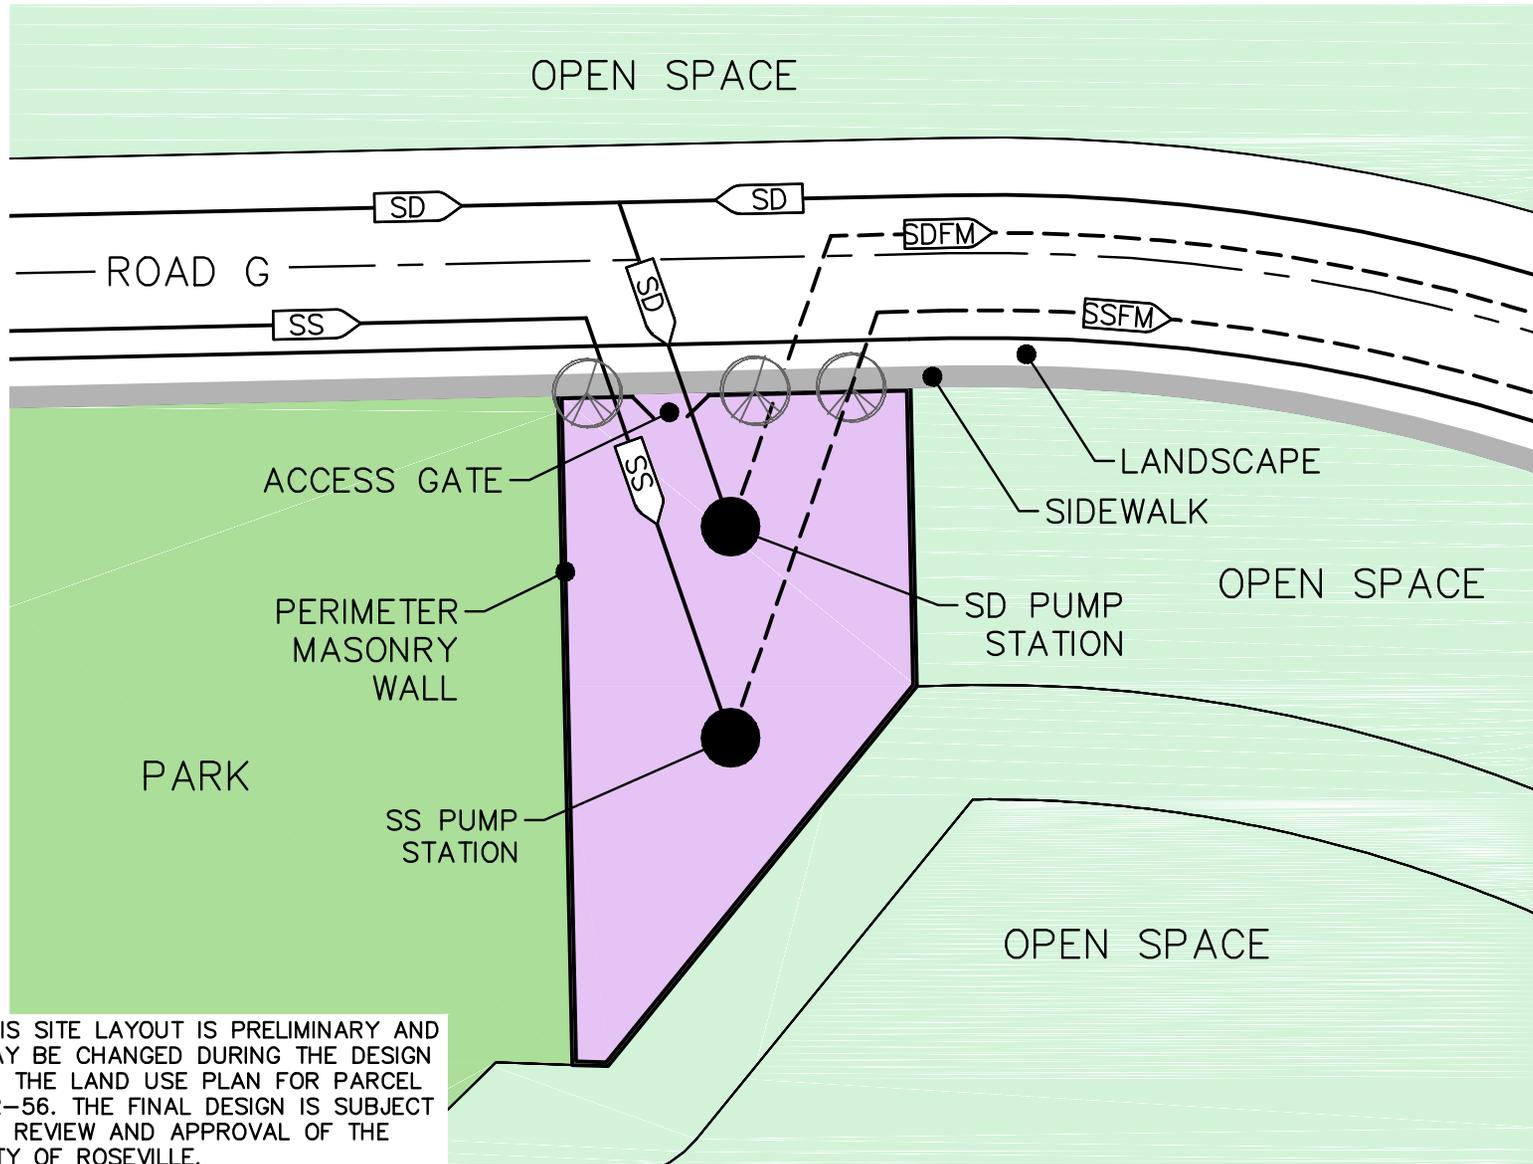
Amoruso Ranch (Wastewater System Conduit Layout)
